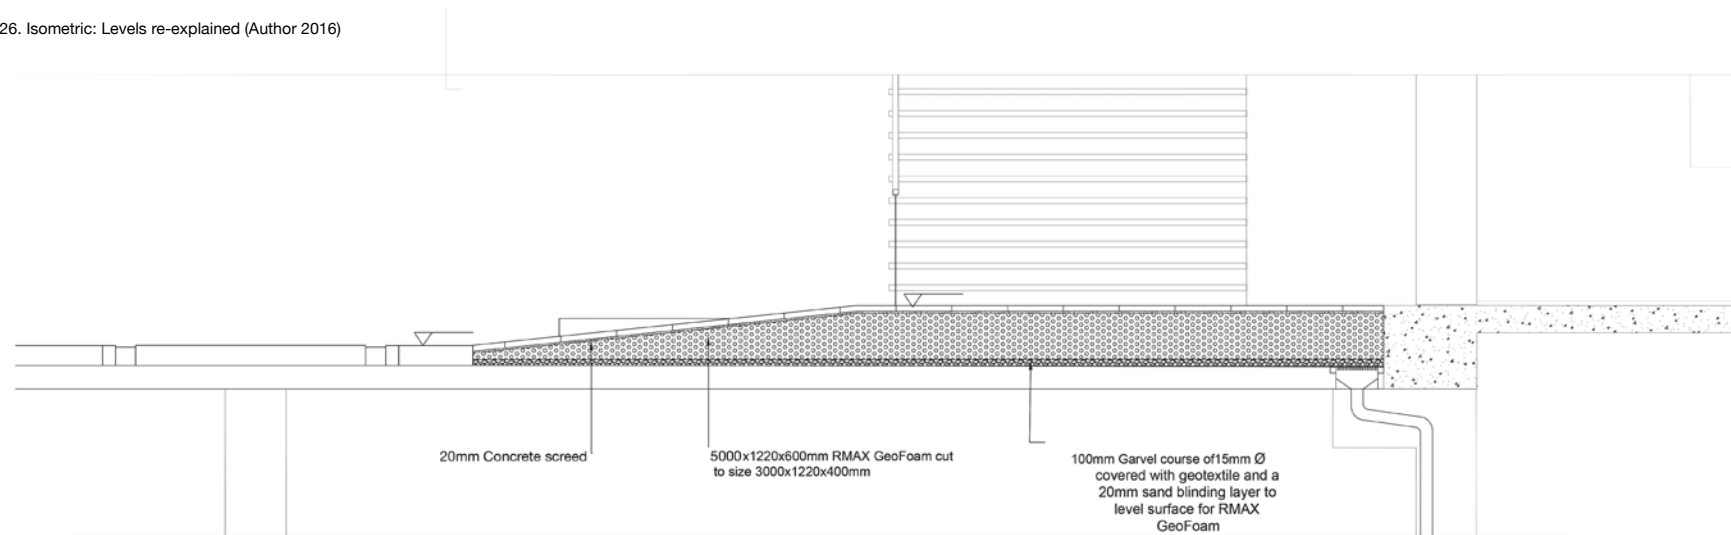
Detail: section through level changes between the courtyard and building plinth (Author 2016)
